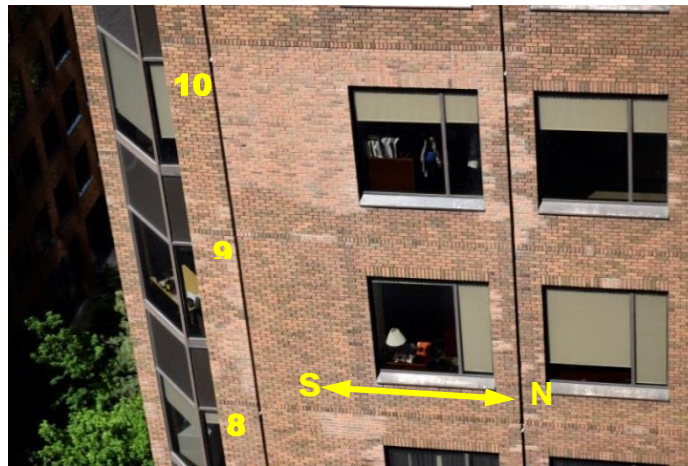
East façade elevation, Block 200 showing extensive repairs to brick façade at level 8, but particularly at level 9
